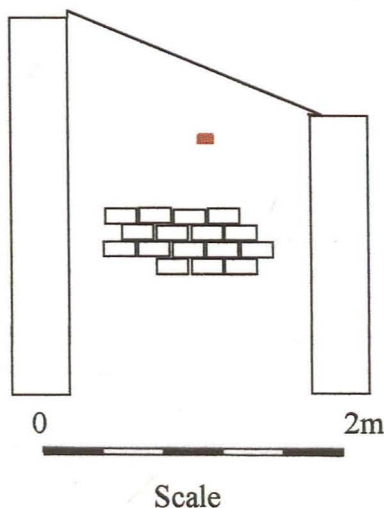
Wall (011), east facing elevation. Sample of brickwork illustrated to show bond. 1:50
